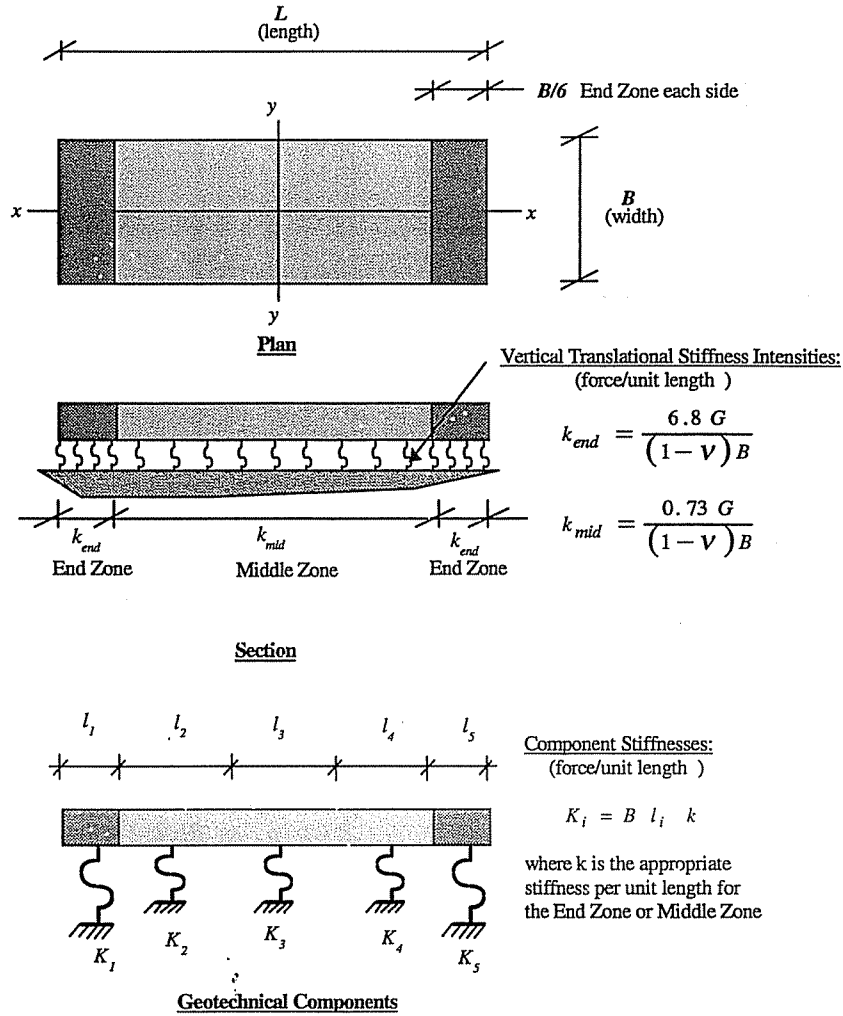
Winkler Component Model of Rectangular Spread Footing
